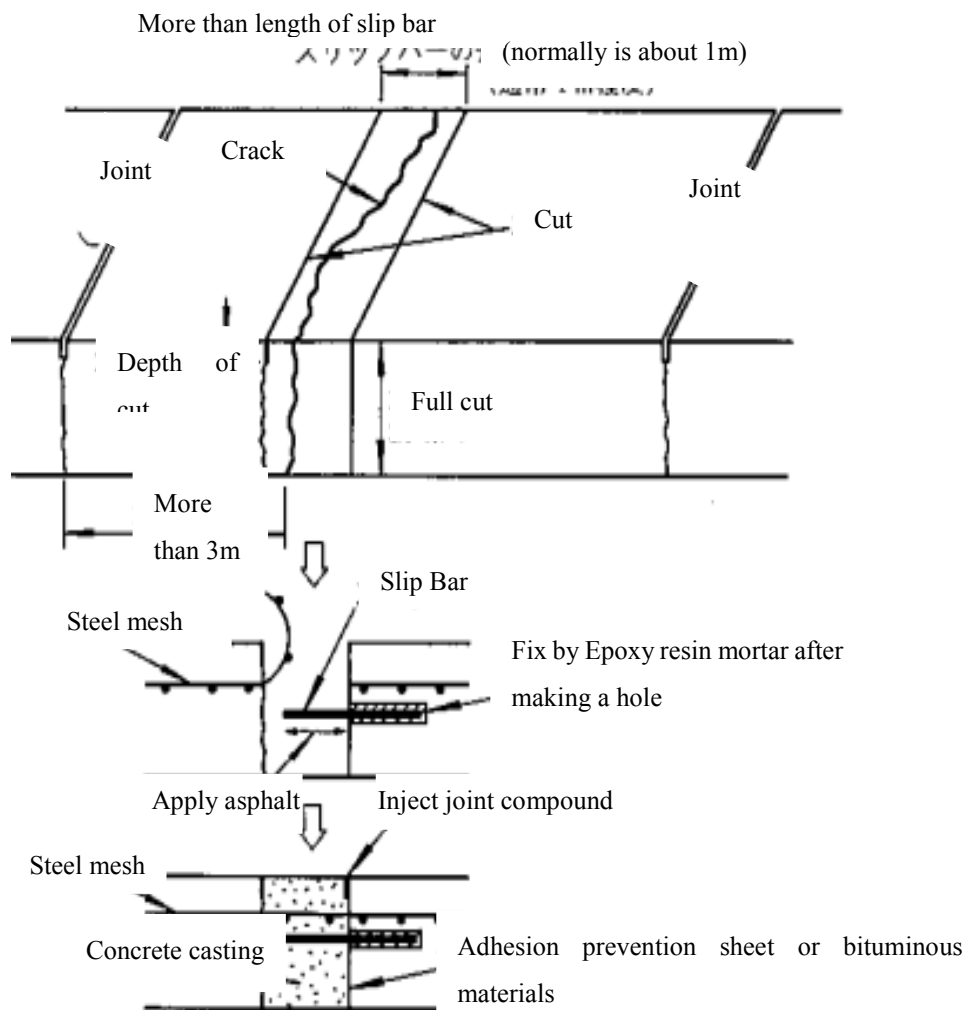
Partial reconstruction near center of concrete slab (example)
